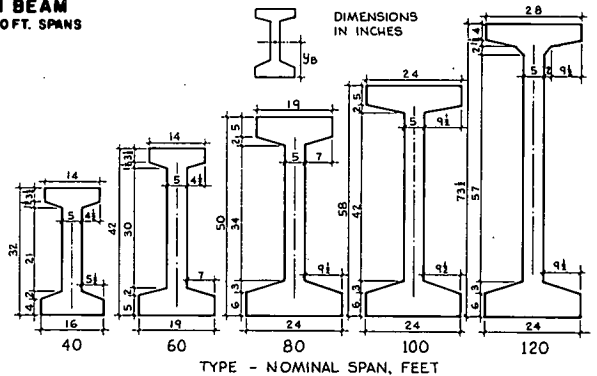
Dimensions and section properties for AASHTO and Washington State standard prestressed concrete bridge beams.
